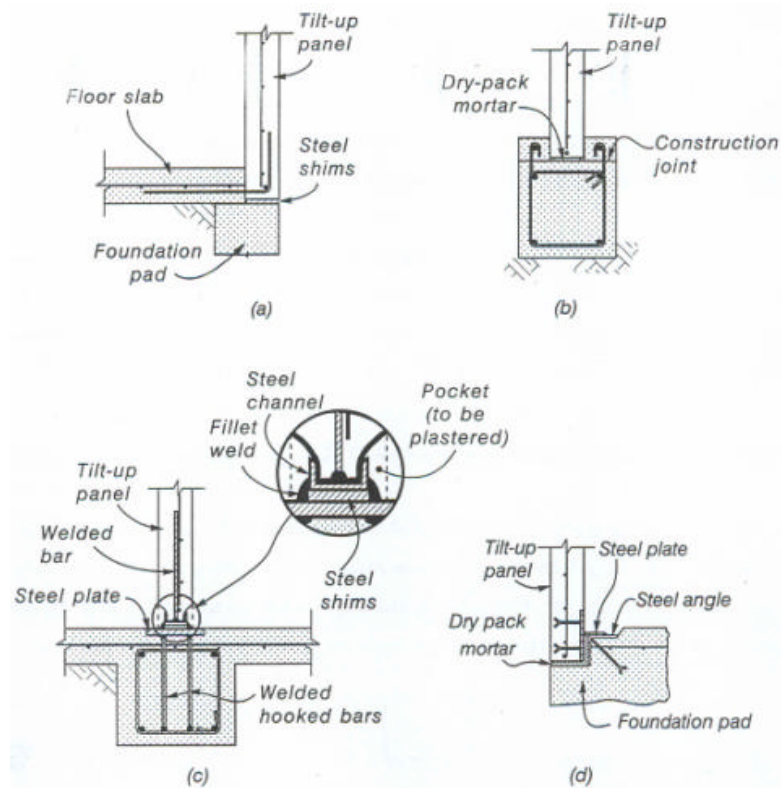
Typical base connection details for tilt-up walls pinned at the base (Restrepo *et al.*, 1996)
